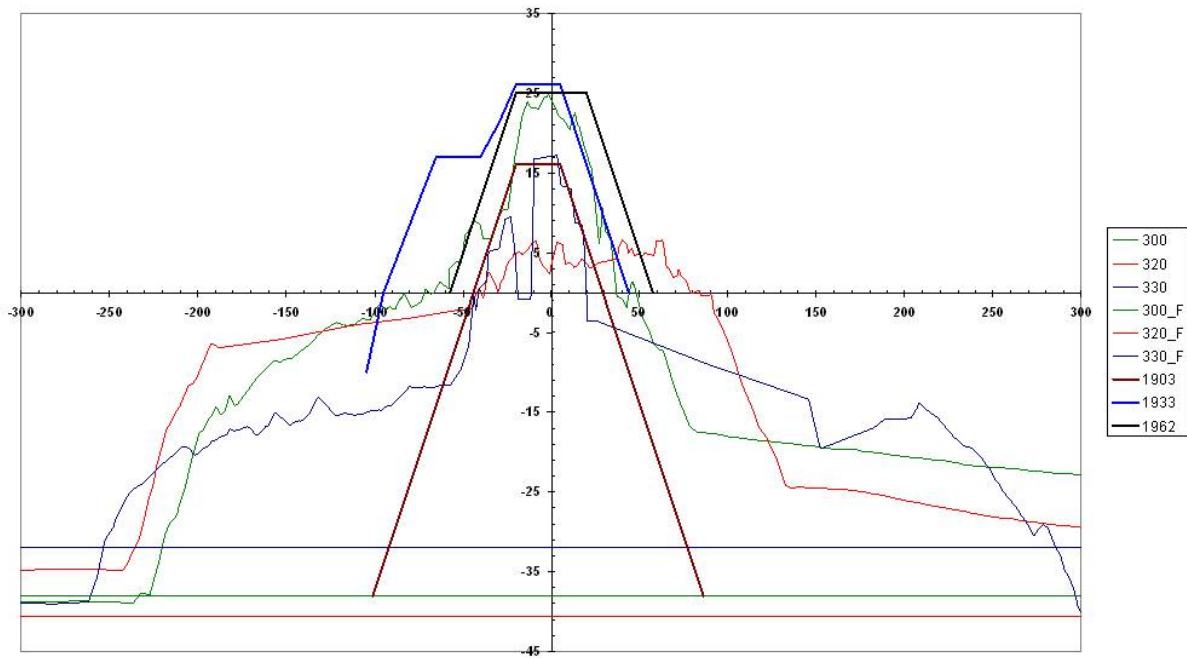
132. South Jetty Cross Section Templates –Seaward Trunk
